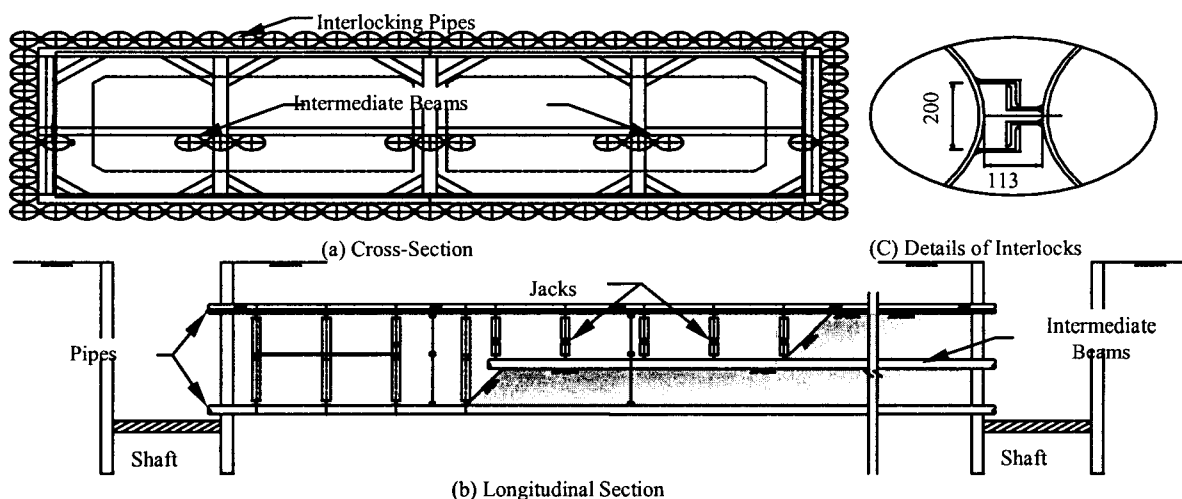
Pipe Shelter and ESA Sections of the Underpass
